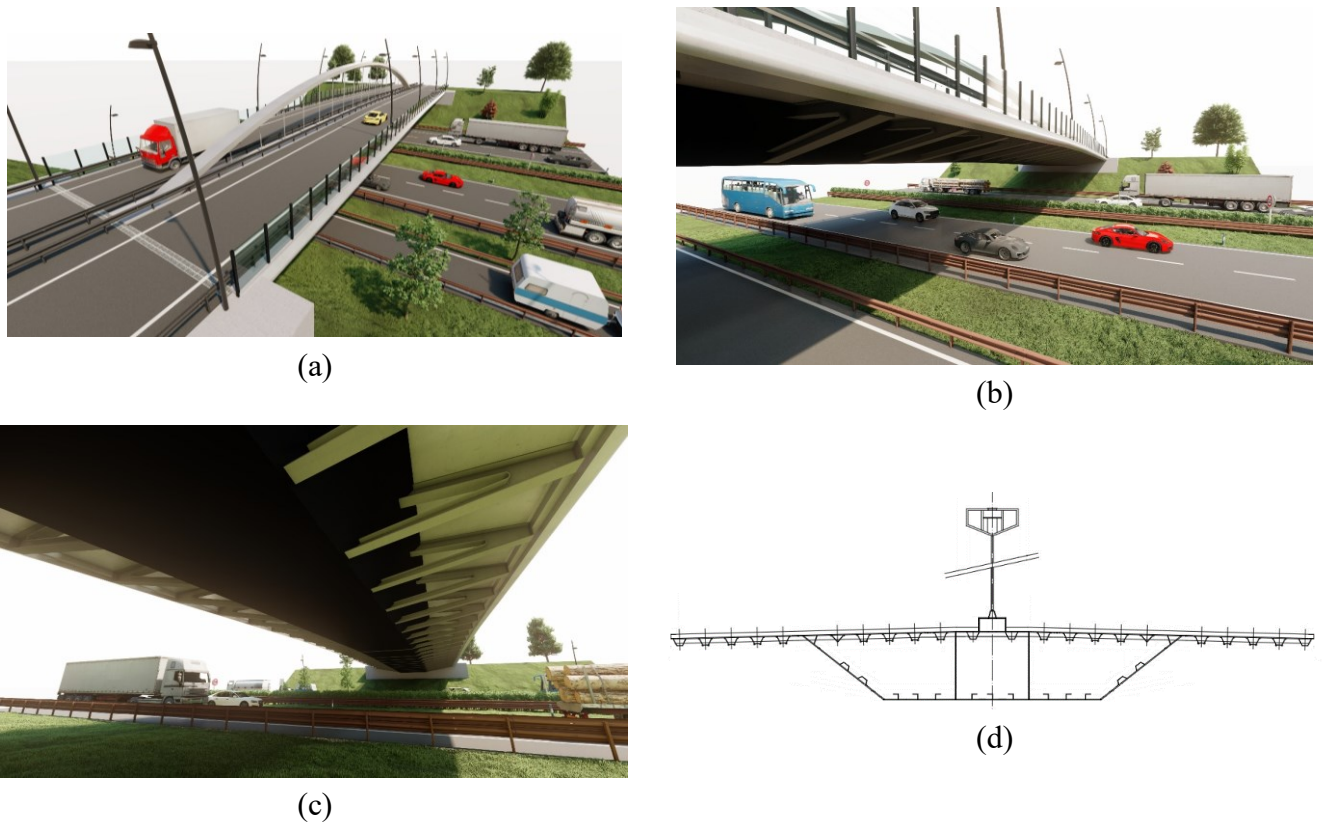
(a-c) 3D render details; (d) Section of the bridge.
